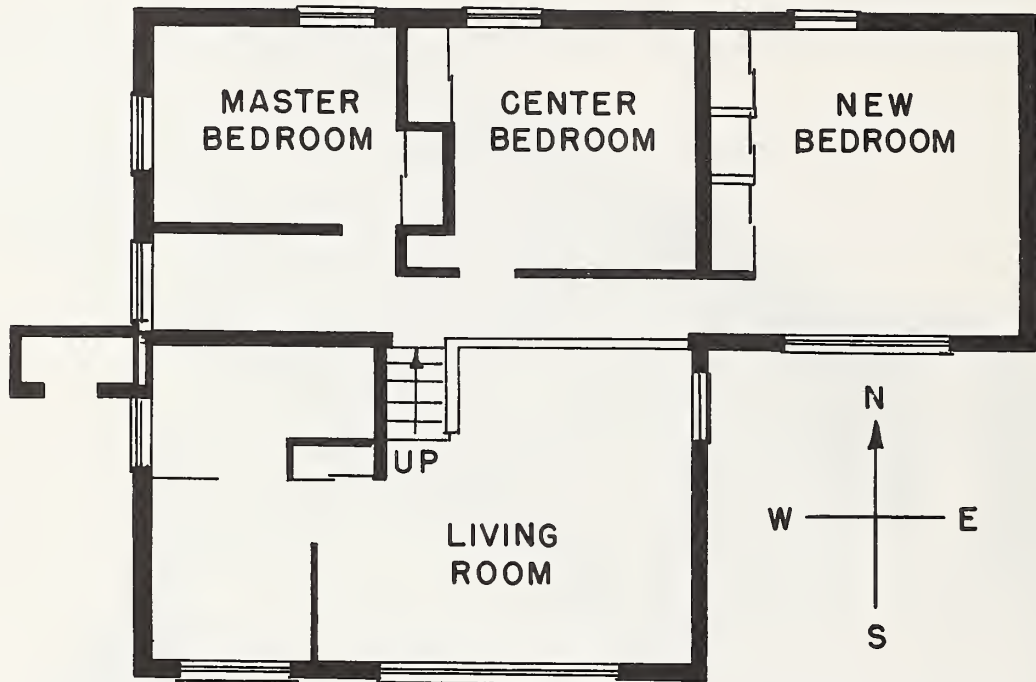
Floor plan of house D, showing the orientation of each of the rooms being tested.
